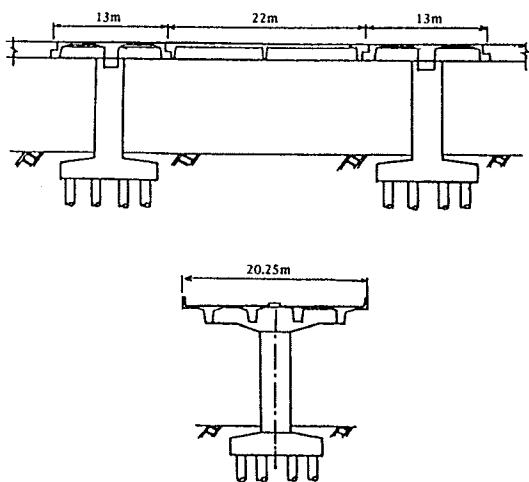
18 Span Highway Bridges at Fukae, Route 3, Kobe Line of Hanshin Expressway
